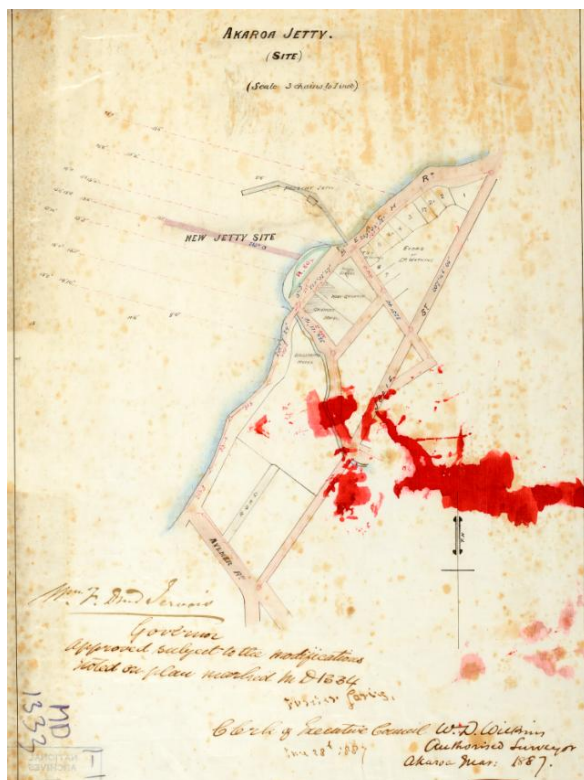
Location of the original jetty/wharf and where the current wharf was built. Source: Wellington Archives New Zealand.
